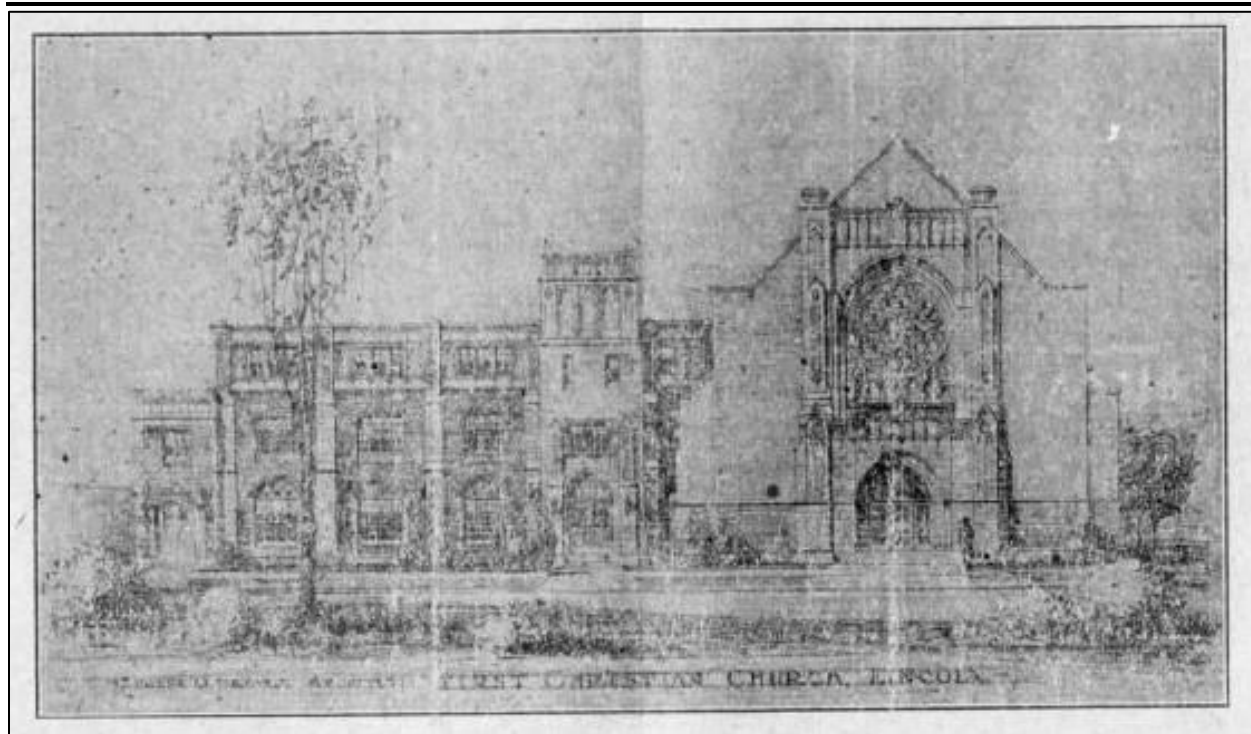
Planned façade (Sixteenth Street) elevation, First Christian Church, Lincoln, NE⁵⁷
